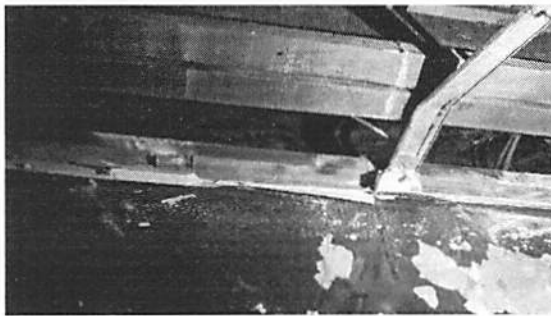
Damaged Wood I-Joists - To be Replaced
